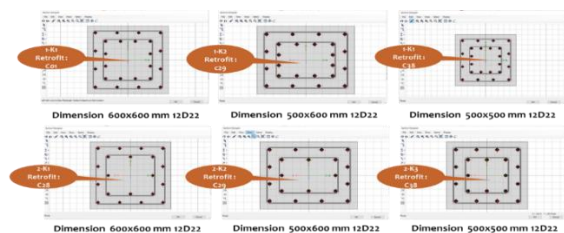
Steel reinforcement details of the concrete jacketed columns.
